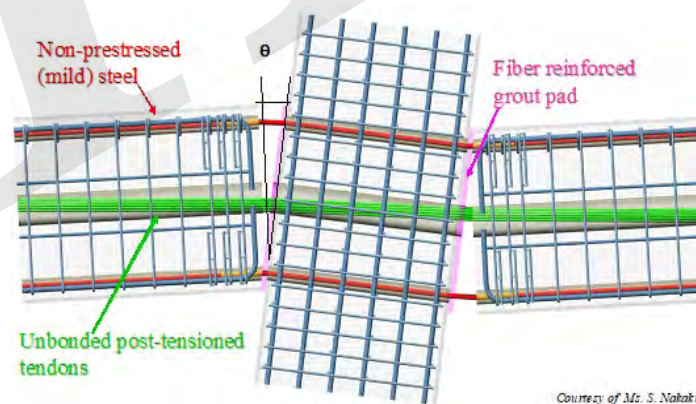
Beam / Column connection using PRESSSS technology with internal mild steel dissipater, figure courtesy of Suzanne Nakaki.
